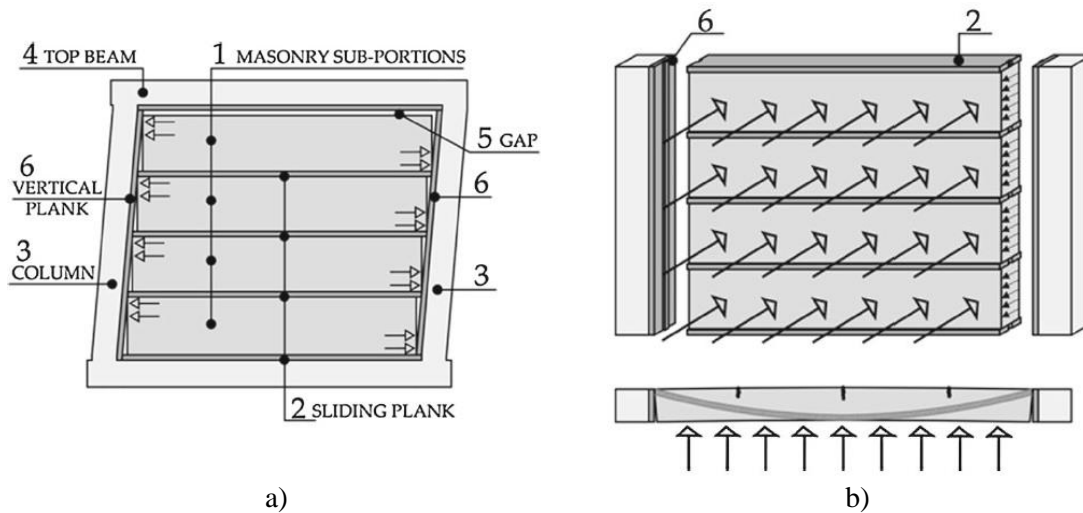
a) Details of the proposed solution and b) out-of-plane resisting mechanism (Preti et al., 2015)
